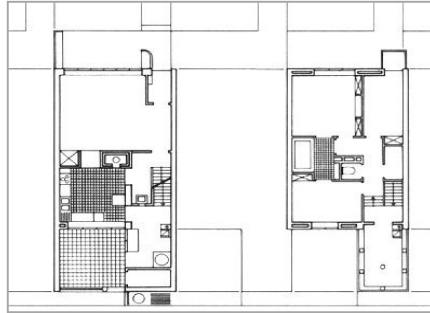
J.J.P. Oud, 1927. Stuttgart Exhibition plan types (Stuttgart – Architektour, 1996).
